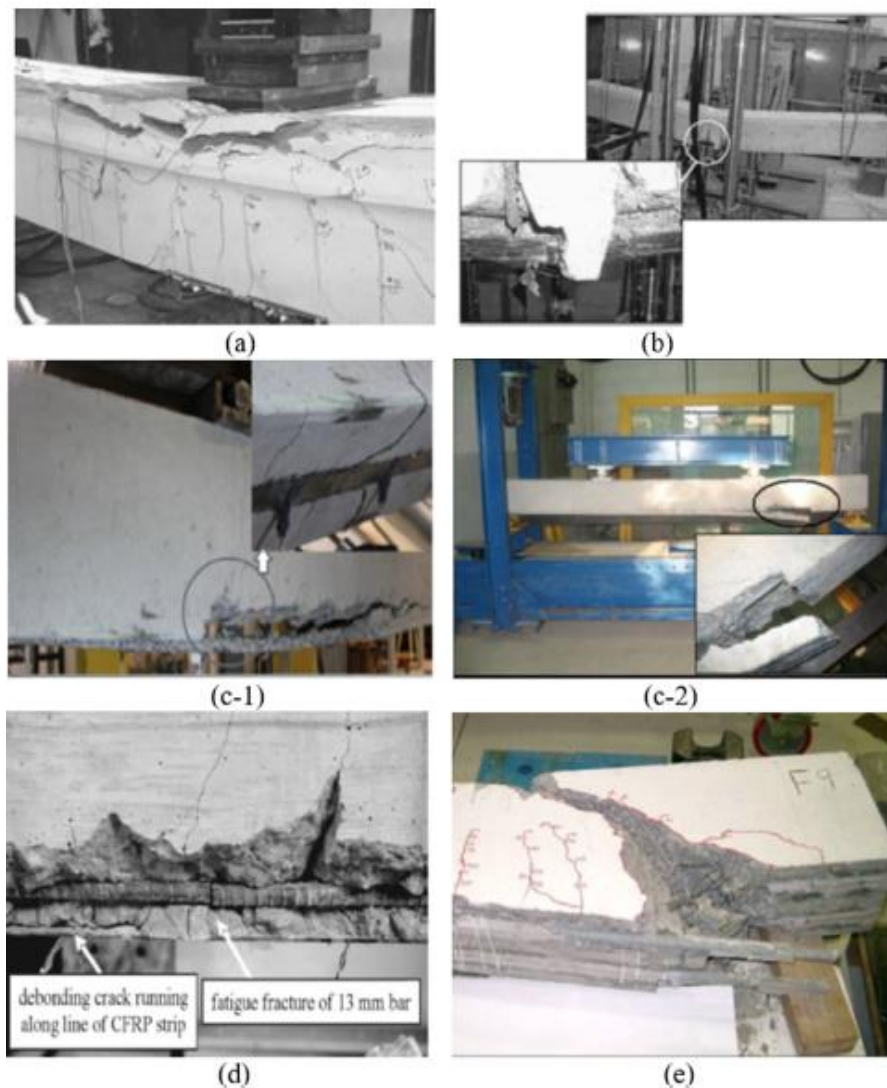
Failure modes of NSM-FRP flexural-strengthened RC beams; (a) Concrete crushing, (b) FRP rupture, (c-1) Debonding failure due to failure of NSM-FRP-adhesive-concrete interface, (c-2) Debonding failure due to concrete cover separation, (d) Rupture of steel reinforcement and (e) Shear failure [2].
